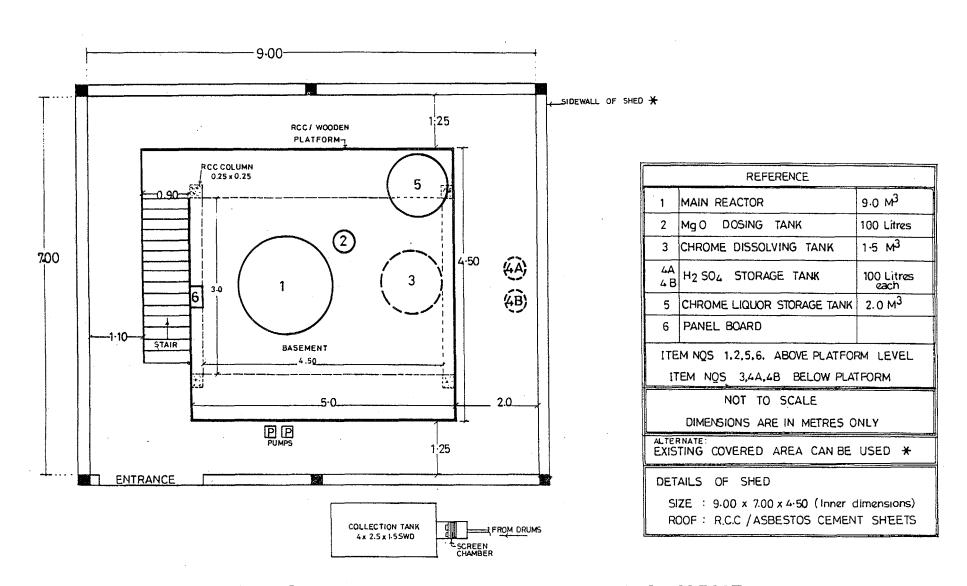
TYPICAL LAYOUT ARRANGEMENT
